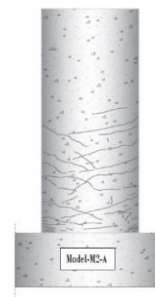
Typical propagation of cracks in concrete during experimental testing of shear failure RC prototype model M2-A.
